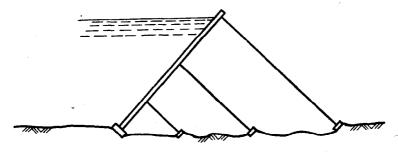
TYPICAL DIRECT-STRUTTED TYPE STEEL DAM
